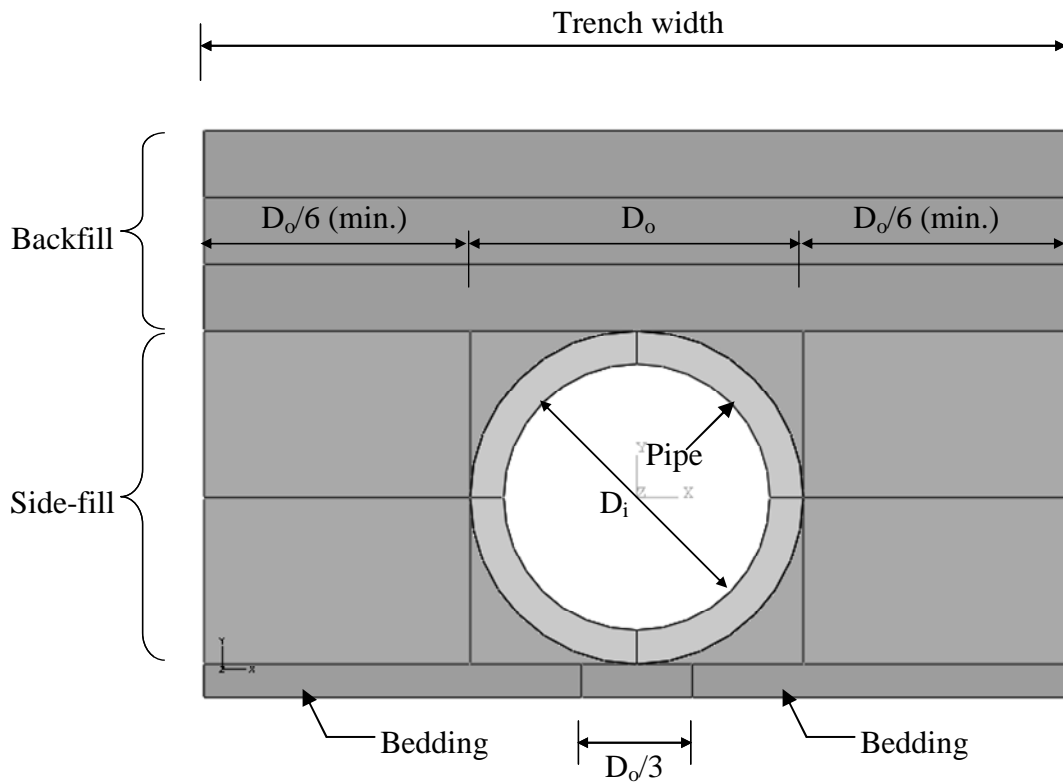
Geometric dimensions of a trench installation FEM model.
